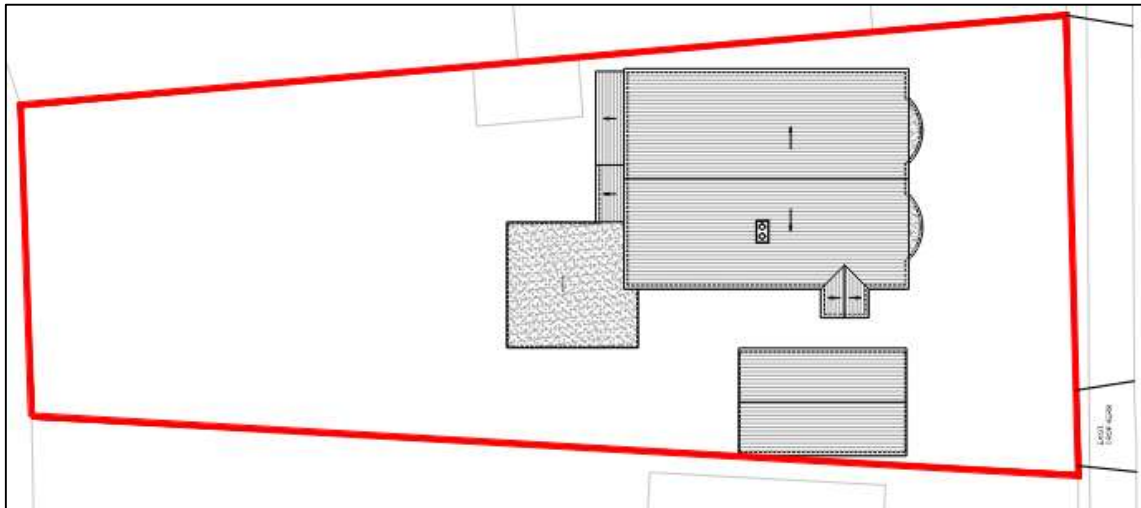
Existing Plan – DE Architectural Consult Ltd
